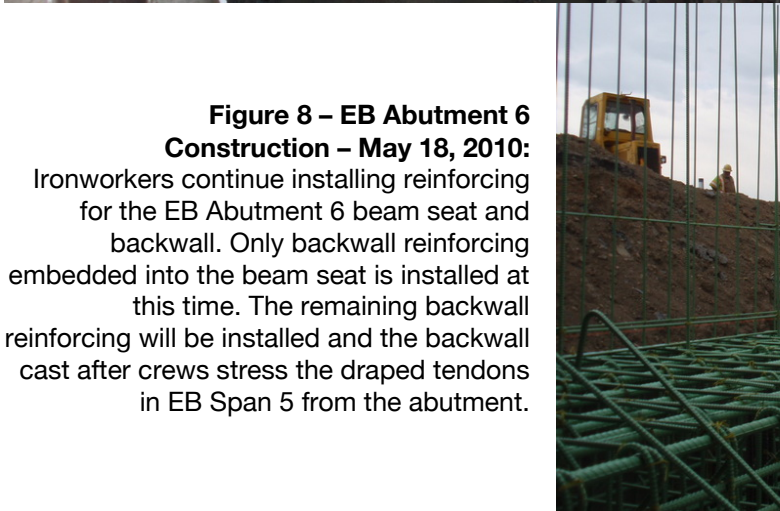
EB Abutment 6 Construction – May 18, 2010:
